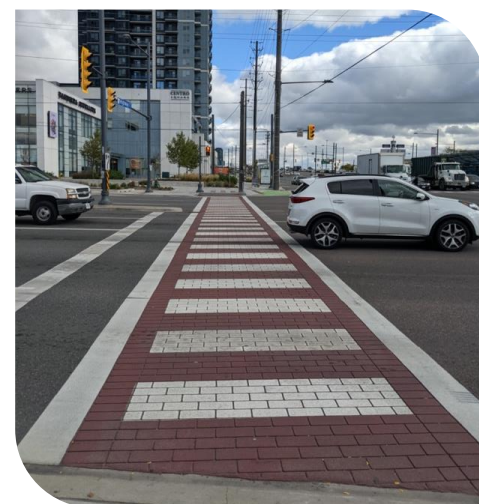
Newly painted striped crossings installed at Highway 7 and Weston Road.
